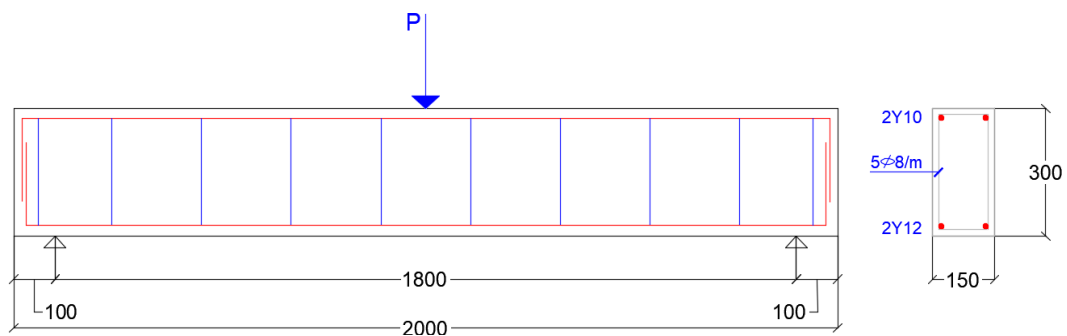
Details of tested Beams Group 1 (Flexural failure beams) in mm.
